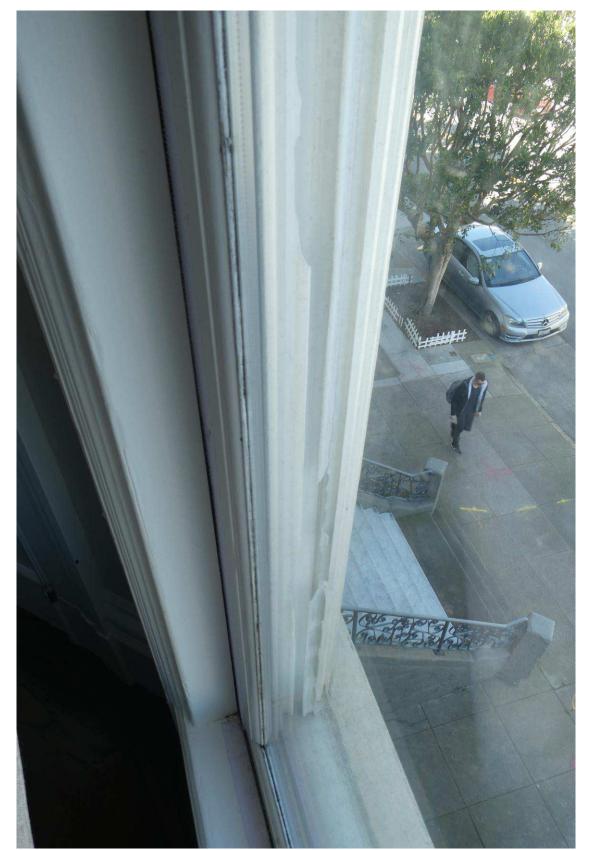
Detail of the damaged/broken vinyl jambs at the Waller Street second story window exterior.
